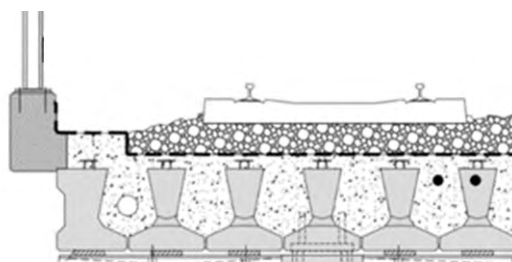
Section for proposed OHLE support at Pier 3 of Malahide Viaduct
